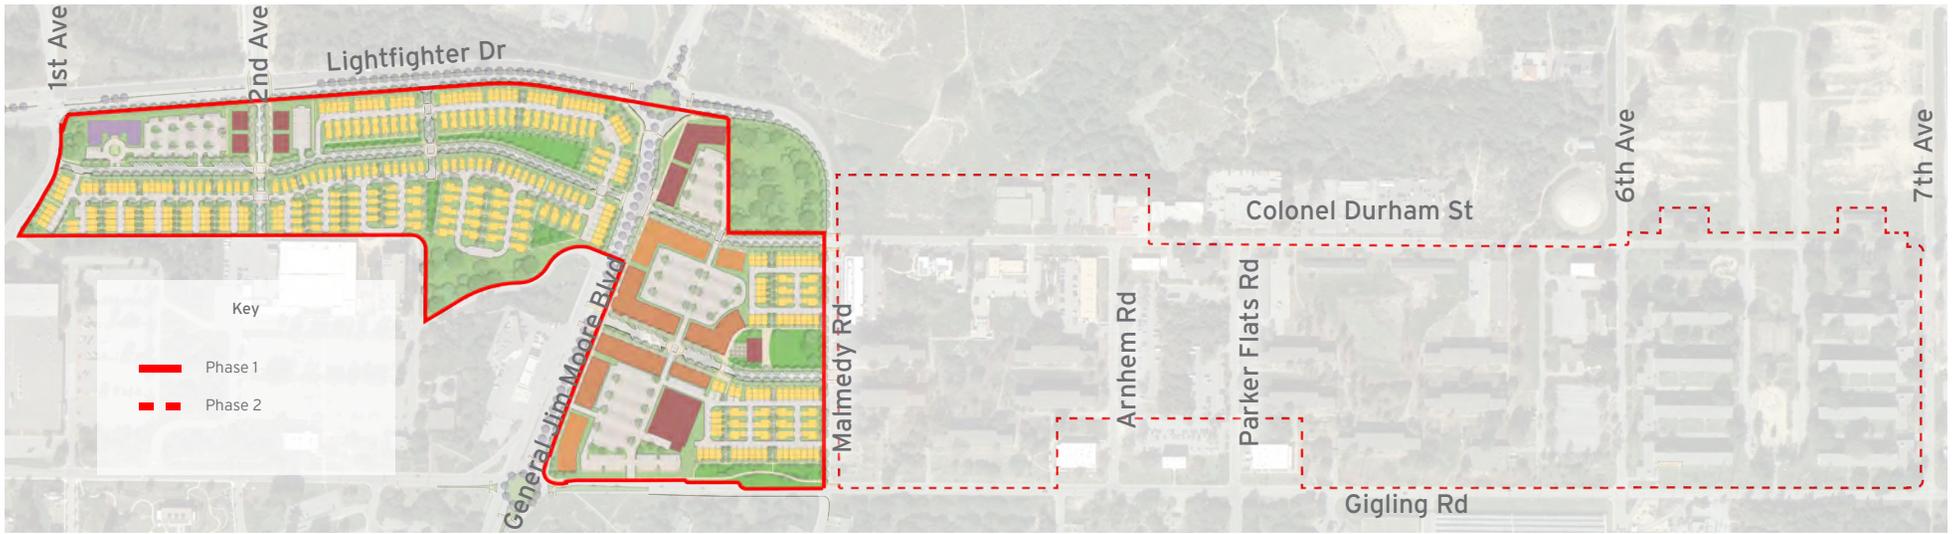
Conceptual Phase 1 Buildout Plan
